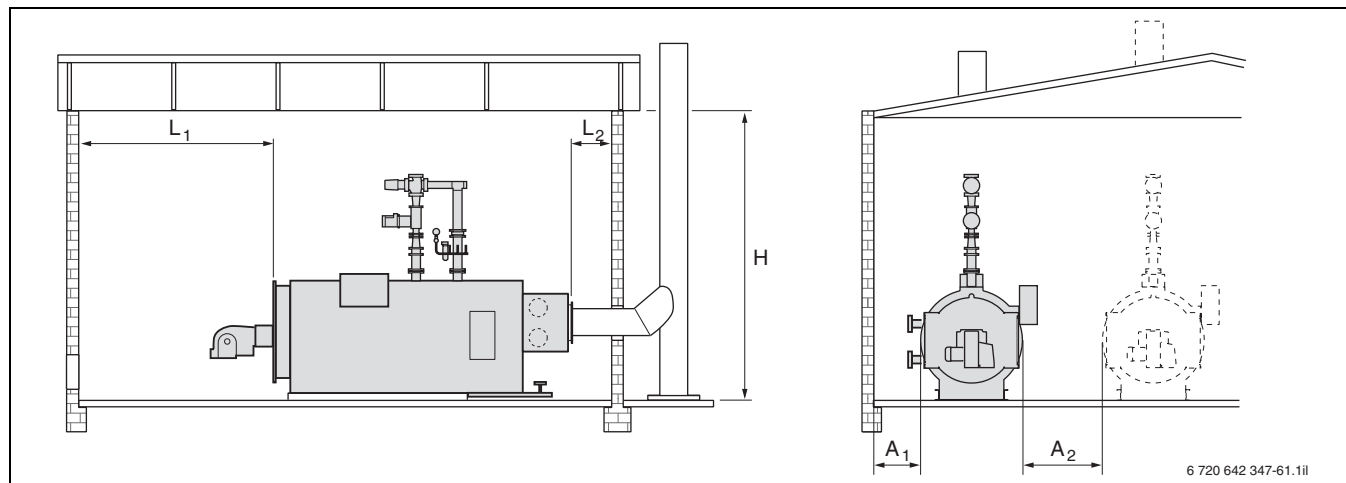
UNIMAT UT-L boiler installation room dimensions
